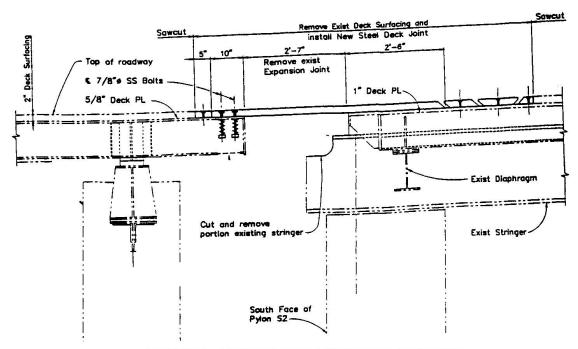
TYPICAL ISOLATION JOINT SECTION
